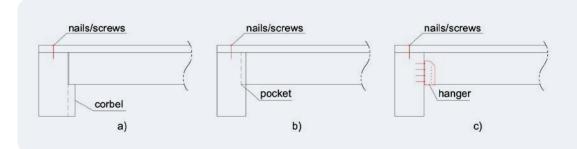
Suggested floor-to-frame connections (floor joists flush with beam): a) floor joist on corbel; b) floor joist in pocket; c) steel bracket/hanger.
